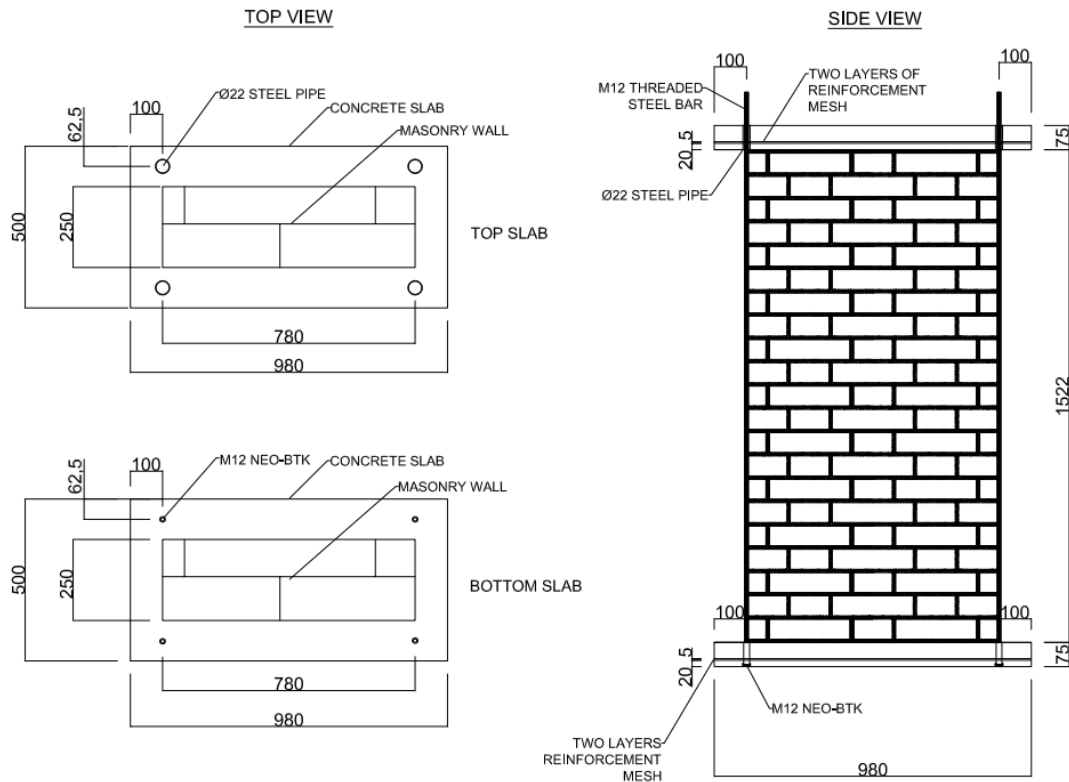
Geometry of the test units: (a) brick walls; (b) RC slabs.
